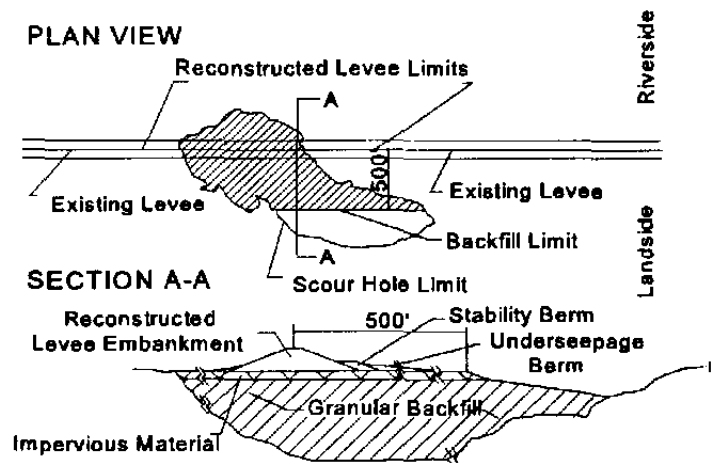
R-471/460. Backfill of the Upstream Scour Hole and Reconstruction of the Levee at Original Alignment
